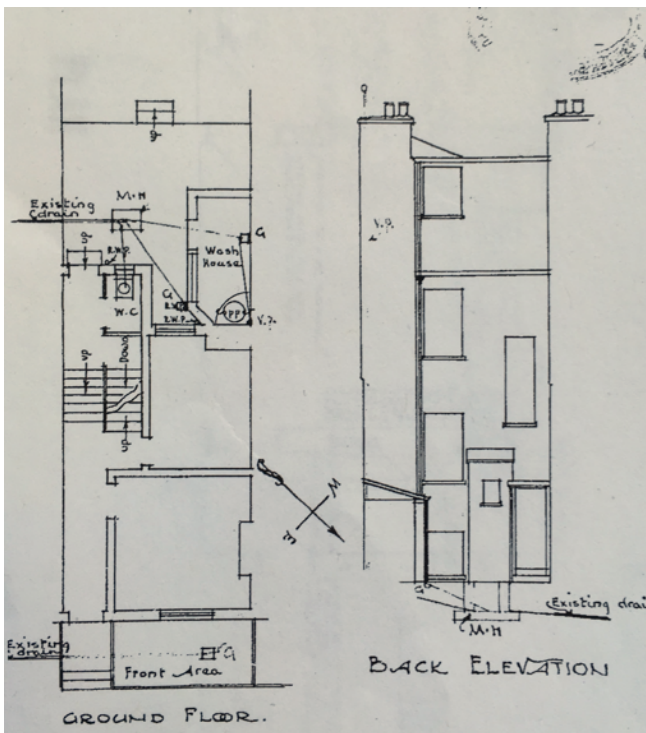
Drainage plan, 1930 (Camden Local Studies and Archives Centre)
